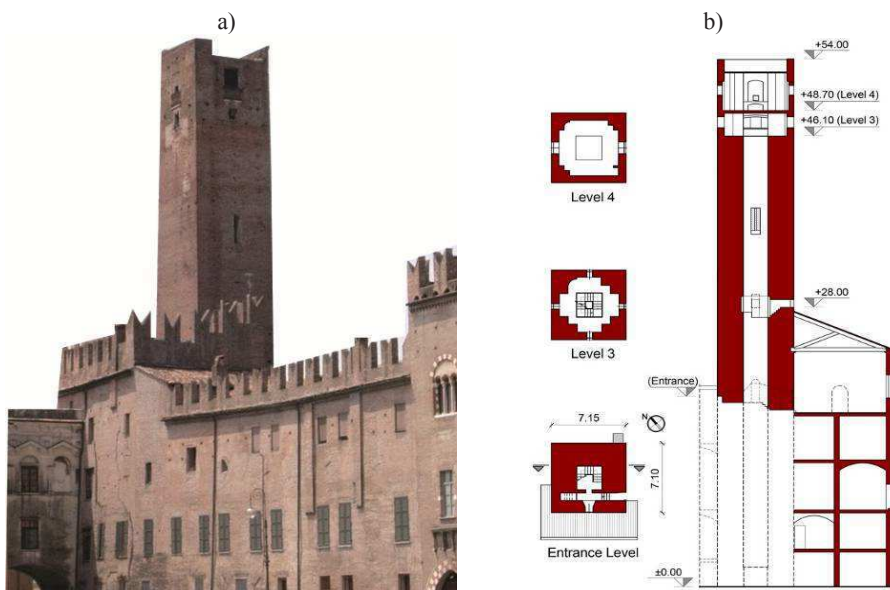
General view (a) and sections (b) of the *Gabbia* tower (dimensions in m)
